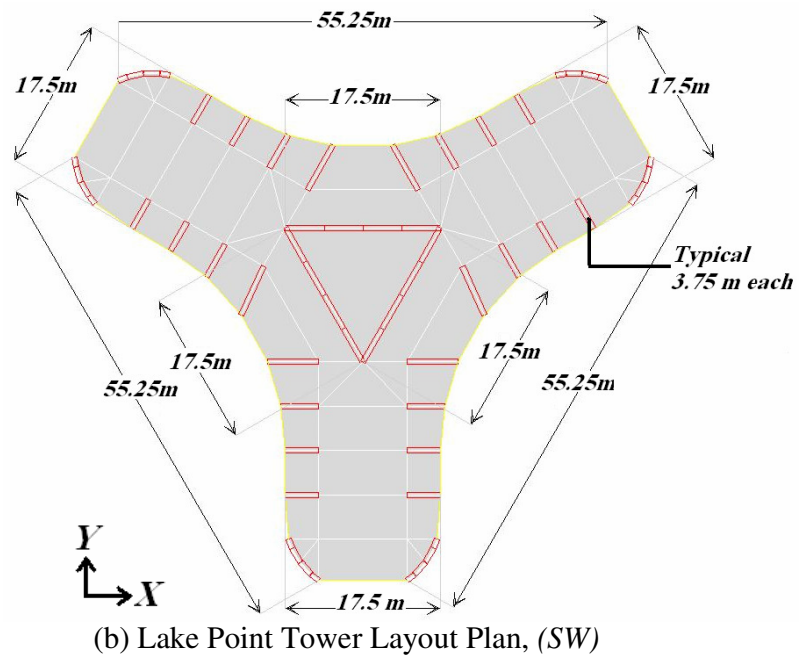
b,c): Lake Point Tower Plan Geometry
